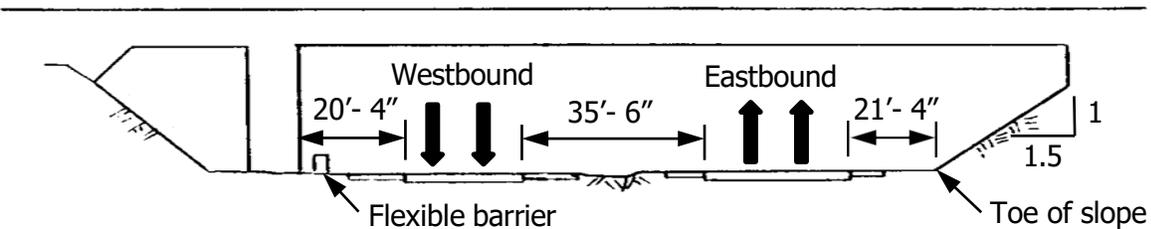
Bridge elevation view of horizontal clearances for separate westbound and eastbound highway features below the bridge, with a flexible barrier.
